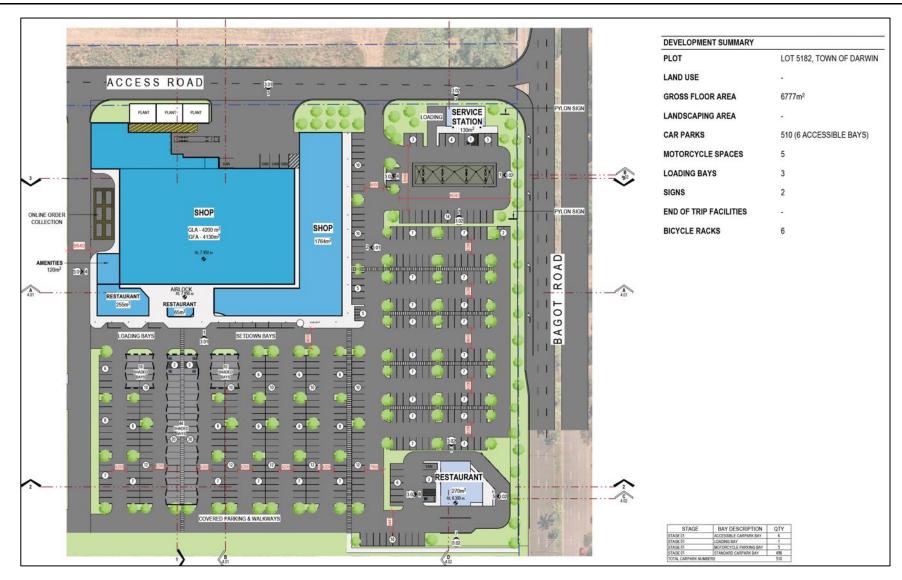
PROPOSED GROUND FLOOR PLAN
